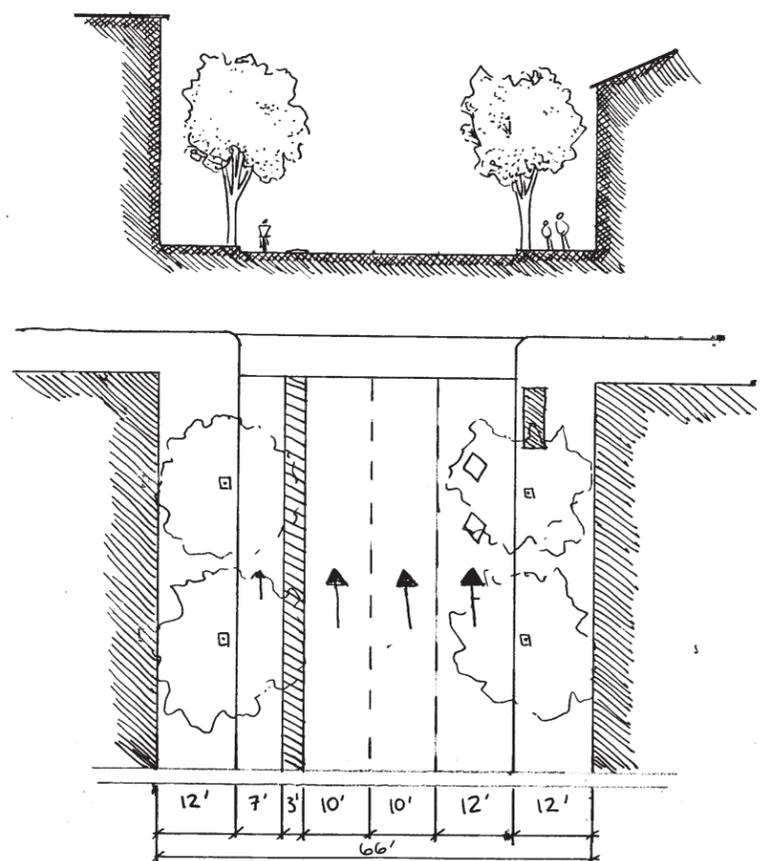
Marion Street -- Conceptual Plan & Cross-Section
